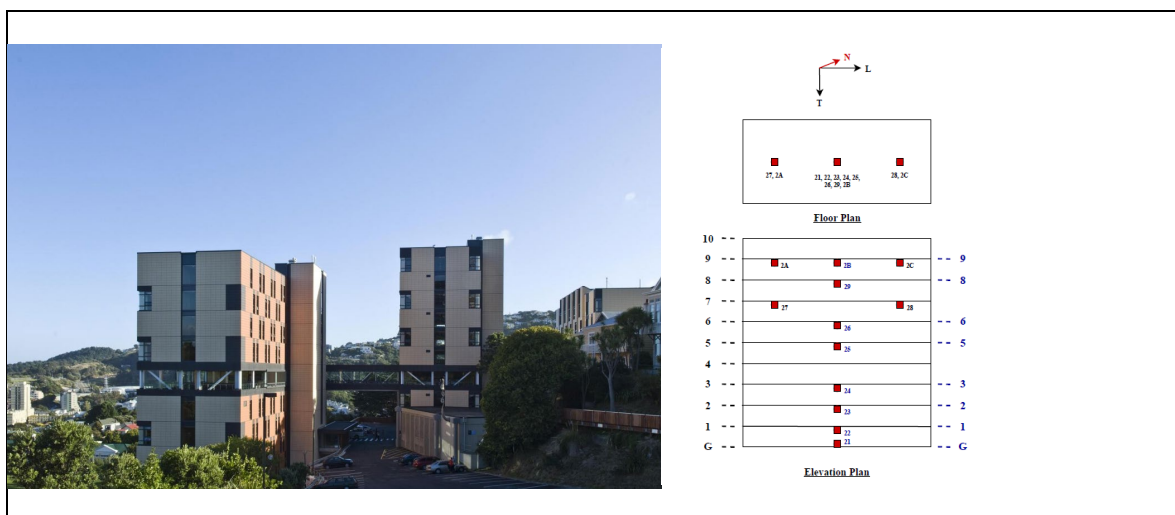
The instrumented central tower of the Te Puni building and detailed floor plan of the seismic array (adapted from Gawne (2025) and Gledhill et al. (2013)).
